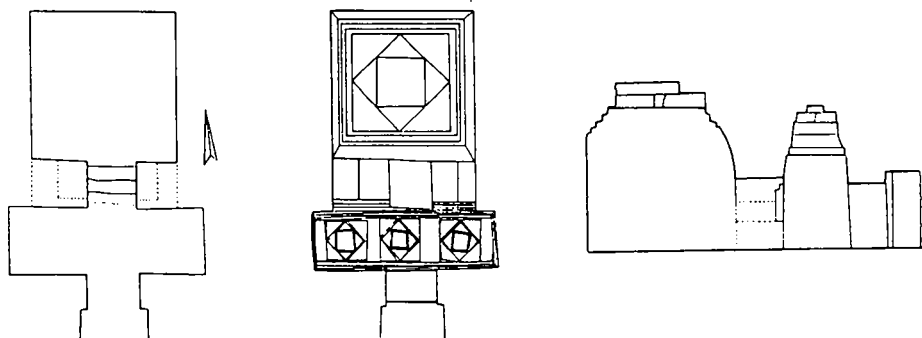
Ground and ceiling plan and section of the large tomb at An-sŏng-dong
